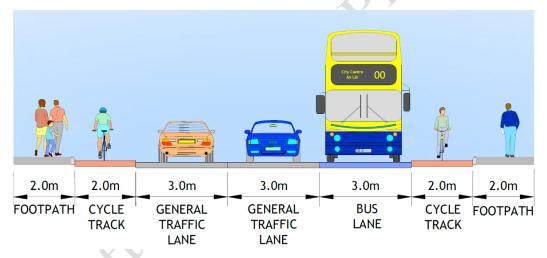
Cross-Section E-E (Relevant to RF5)
